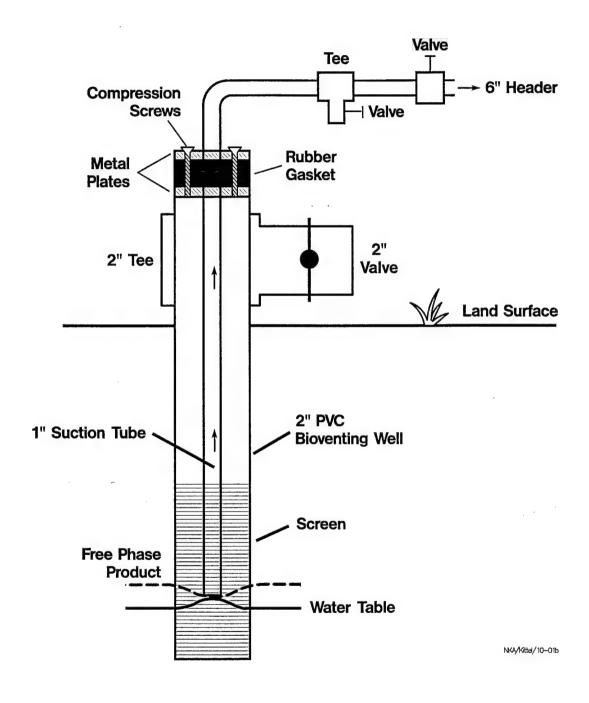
Slurper Tube Placement and Valve Position for the Bioslurper Pump Test
